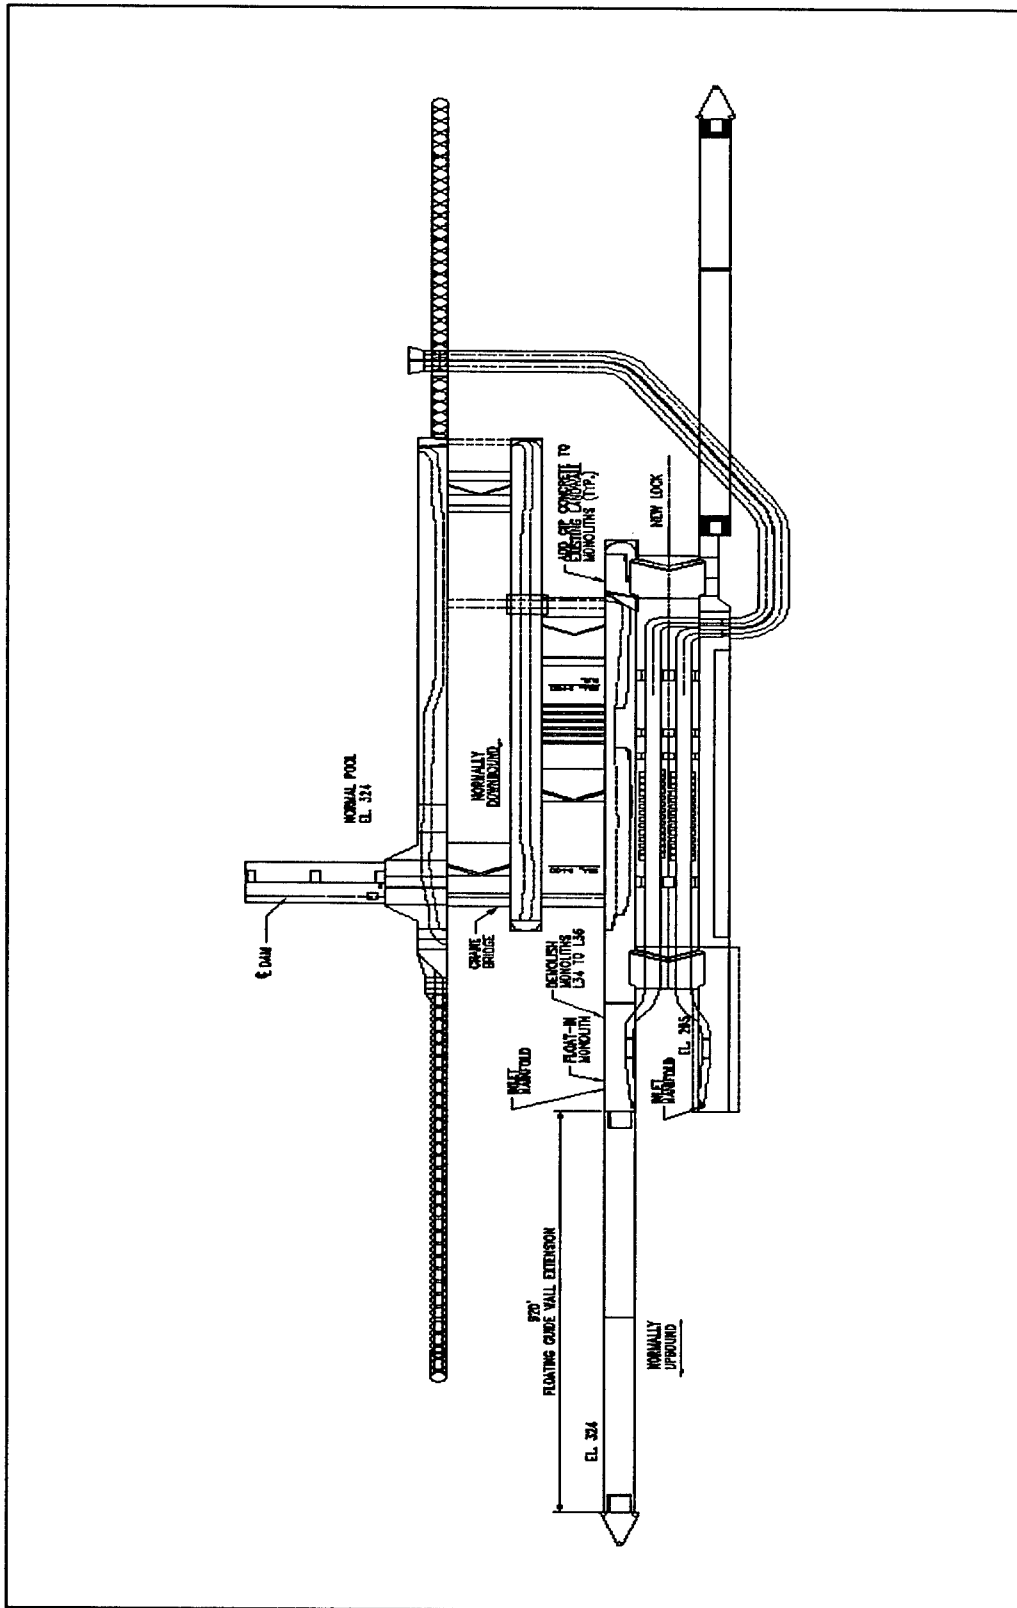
Plan 6, plan view of lock, conventional intakes, culverts in chamber
